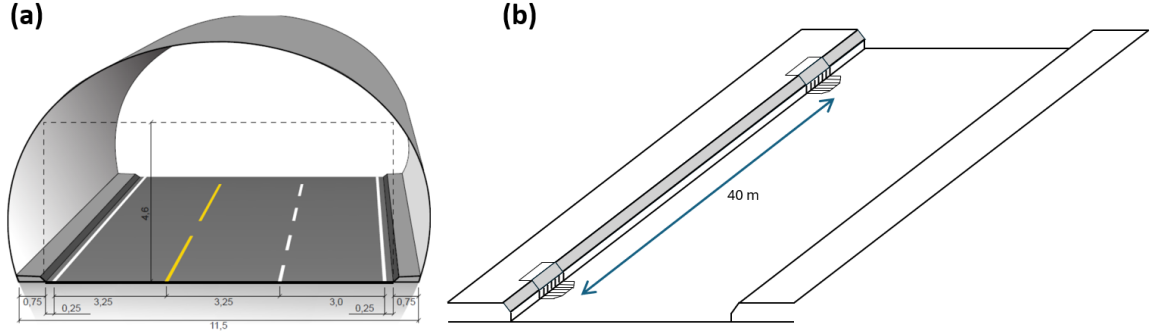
a) Tunnel profile for T11.5GS road profile (Source: N100:2023 - Tillegg B), and b) the minimum distance between consecutive drains
